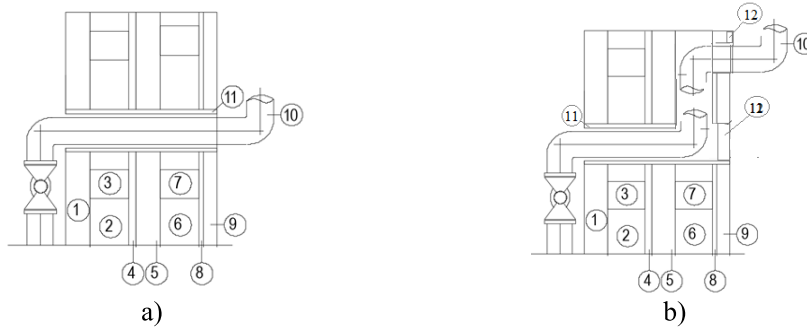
Gas pipeline installation model frame type building external wall: 1 – Facade finishing boards; 2 – Air gap between the external wall of the building and the insulation material; 3 – Frame finishing boards (Lathing); 4 – Wind and steam membrane; 5 – Wood fiber or USB-3 boards; 6 – Insulation material; 7 – Frame finishing boards (Lathing); 8 – Vapor barrier (film); 9 – Interior finishing material (plaster); 10 – Gas pipeline; 11 – Gas pipeline protective sleeve; 12 – Ventilation hole.
